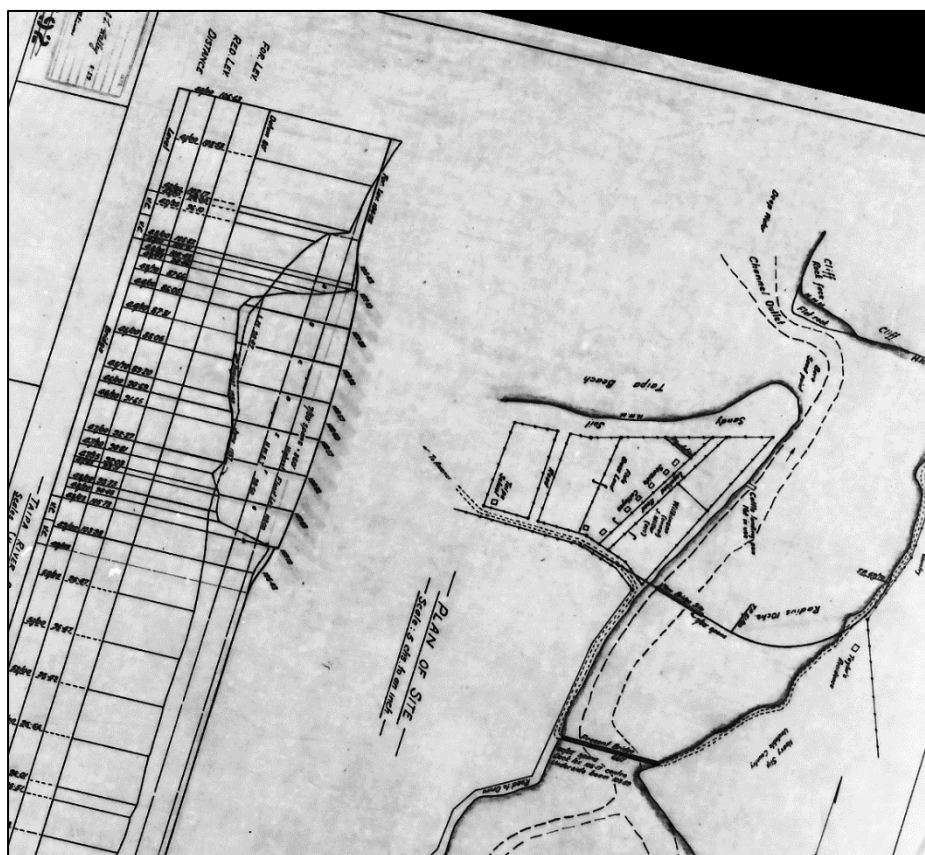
Detail from 1960s Bridge Plans, no date (source: Awanui – Mangonui Road, Taipa Bridge No. 272, supplied by client)
